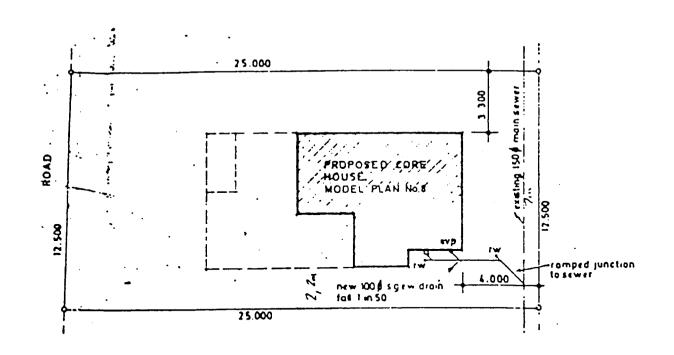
FIGURE TYPICAL SITE PLAN FOR 300M2 PLOT
